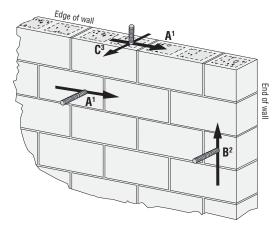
B. Allowable Anchor Locations of <sup>7</sup>/<sub>8</sub>"-Diameter Threaded Rod and #4 and #5 Rebar for Full and Reduced Load Capacity When Installation Is in the Top of Fully Grouted CMU Masonry Wall Construction
